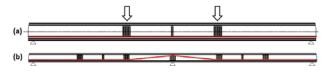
Straight tendon profile configuration – (a) Simply supported beam (b) Statically indeterminate beam
